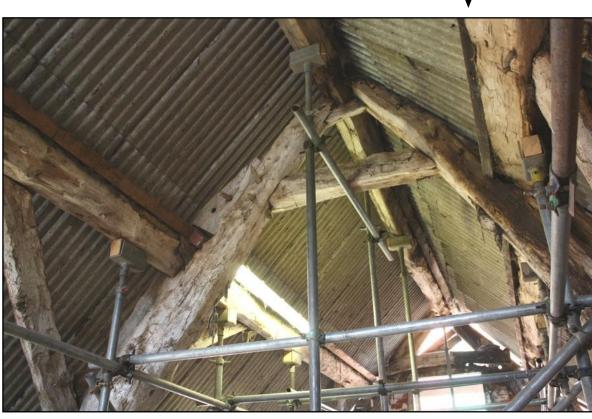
View of the centrallyplaced cruck frame in the animal shed at Holywell Farm , showing upper and lower packing pieces behind the blade, with a brace halved lap jointed with the lower one.
